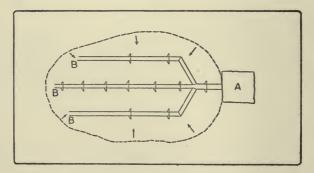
A, drainage well beside a pond. B, tile drains conducting water from the pond into the well.
